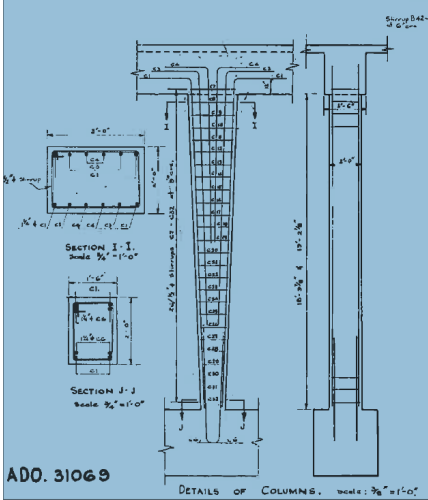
Reinforcing detail of the Underpass Pier frame column and beam–column joint.
